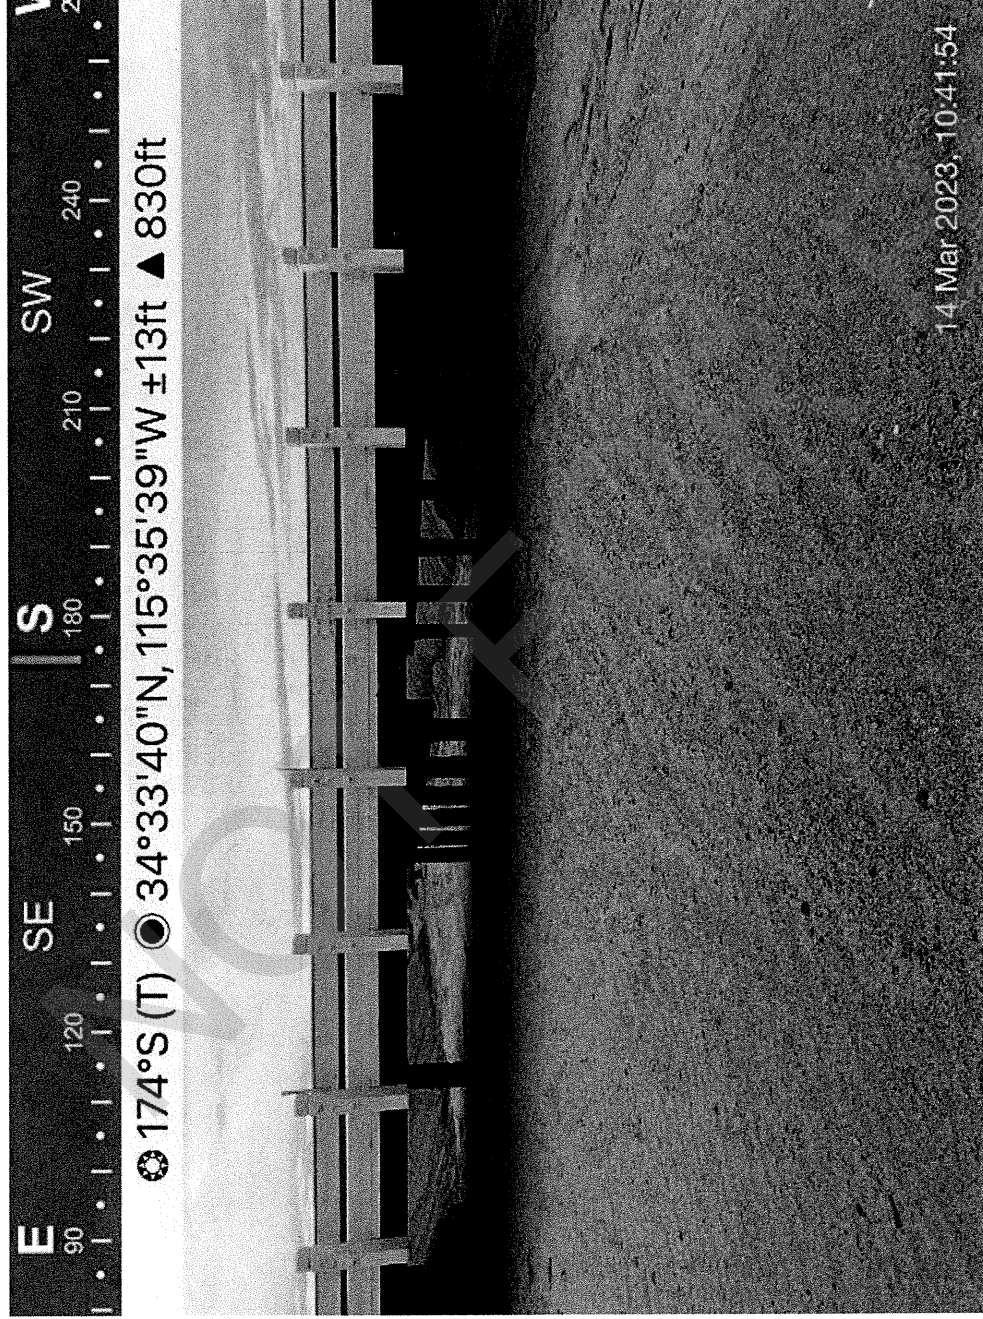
Downstream View of Lanzit Ditch Bridge, Facing South
